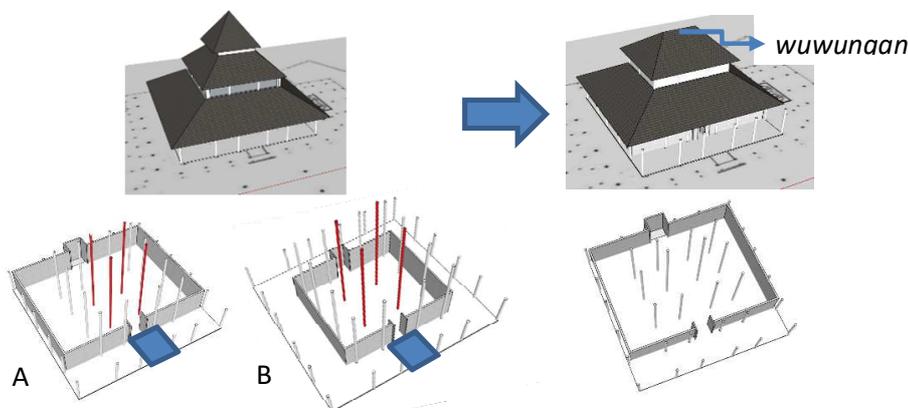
Architectonic Transformation at GMSC, tiered *Tajug* to *Limasan* and formation possibilities of the early wall (A or B) with basin before brick wall equipped later [17]
